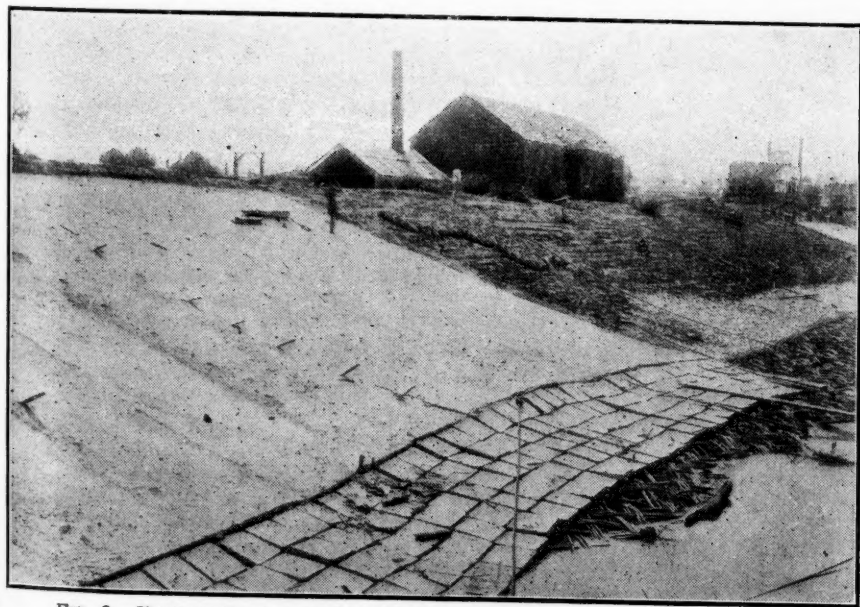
VIEW OF GASCONADE BOAT YARD, SHOWING CONCRETE BANK REVETMENT.
